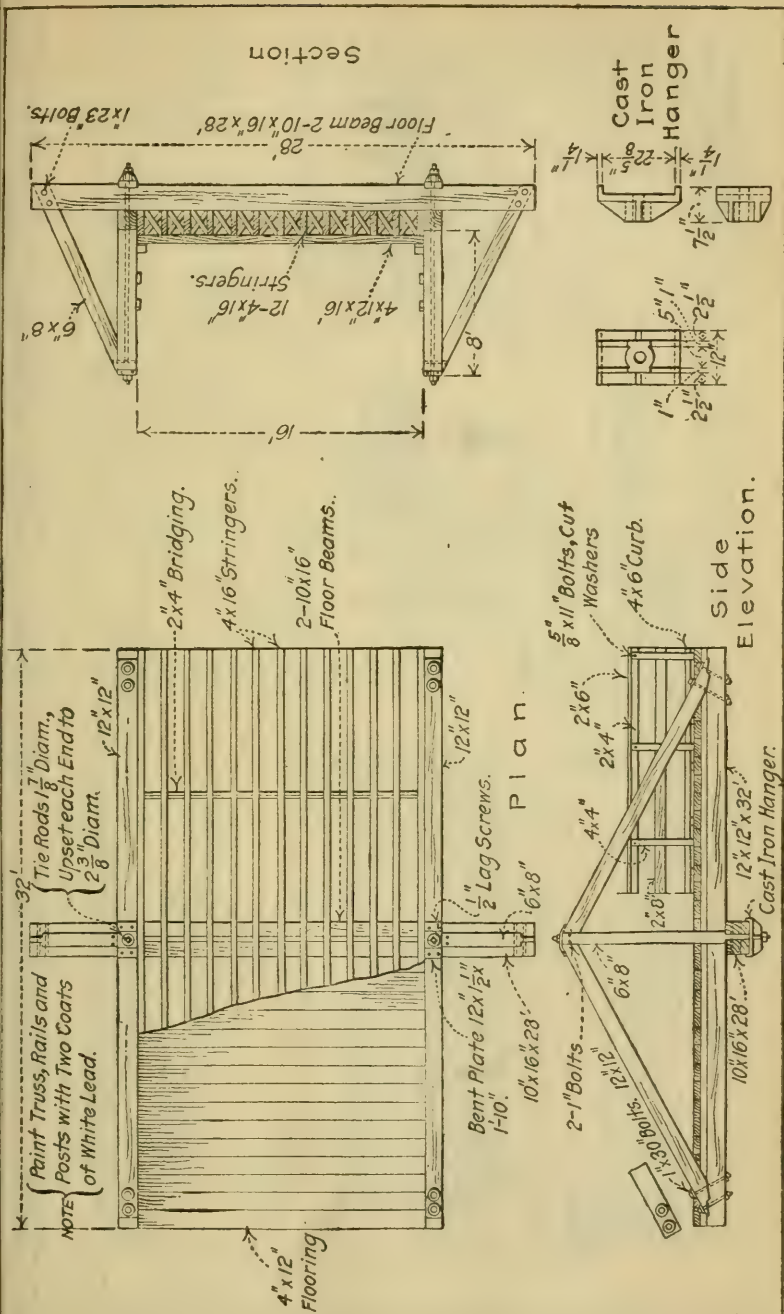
30' span king post timber bridge. State of Wyoming.
